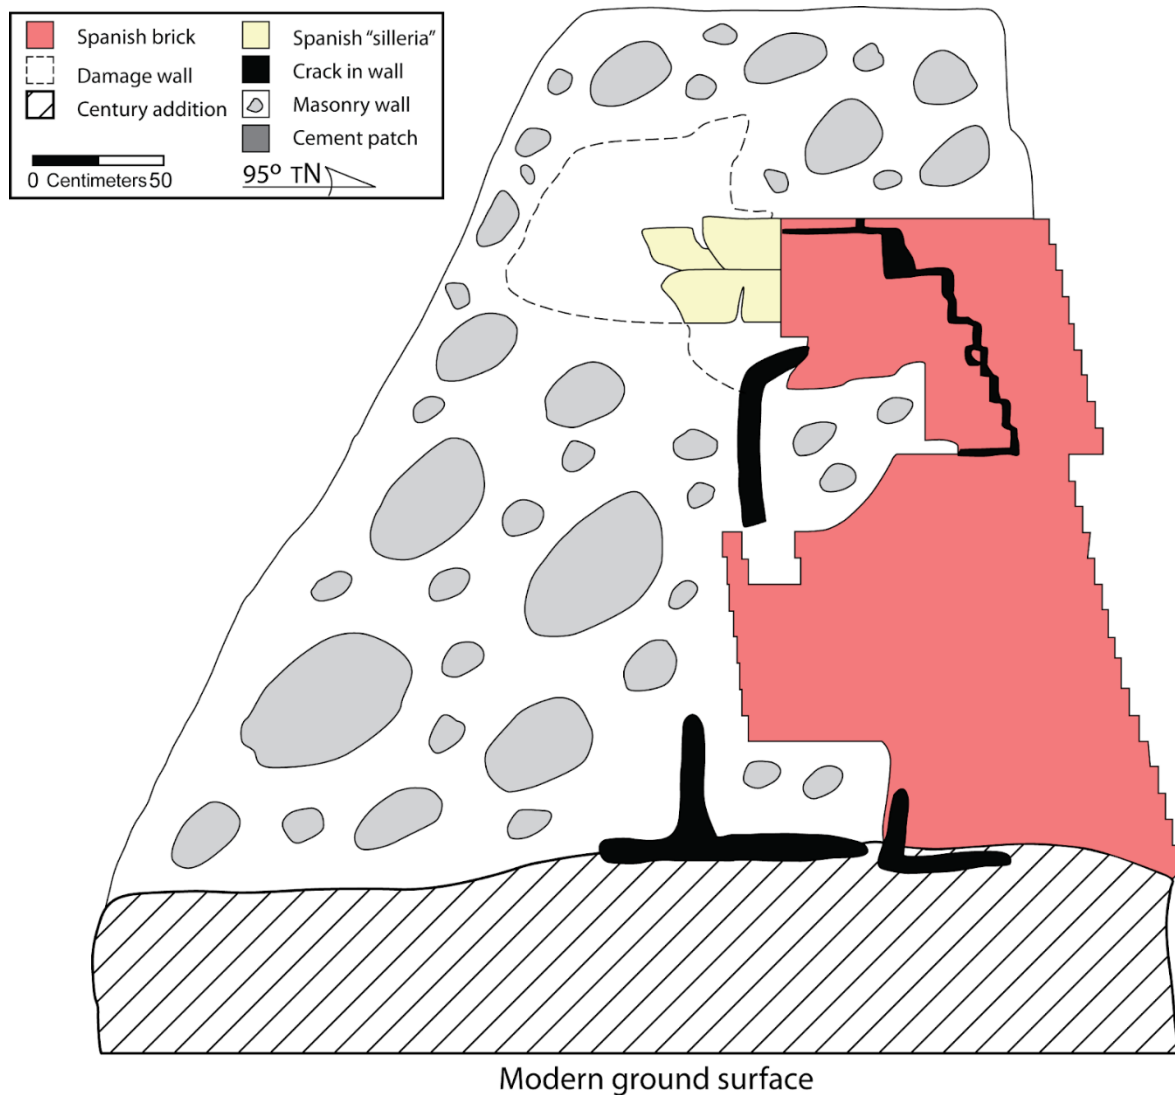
Feature 06 Northwest Corner of the Embankment Facing South
